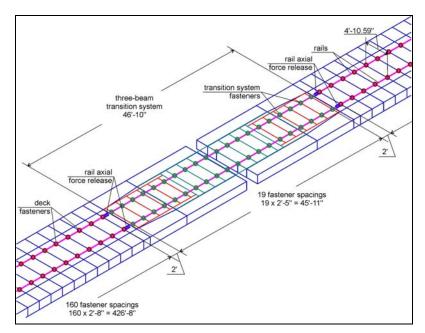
Expansion Joint Model – Rails and Fasteners – Dimensions in Feet and Inches.
